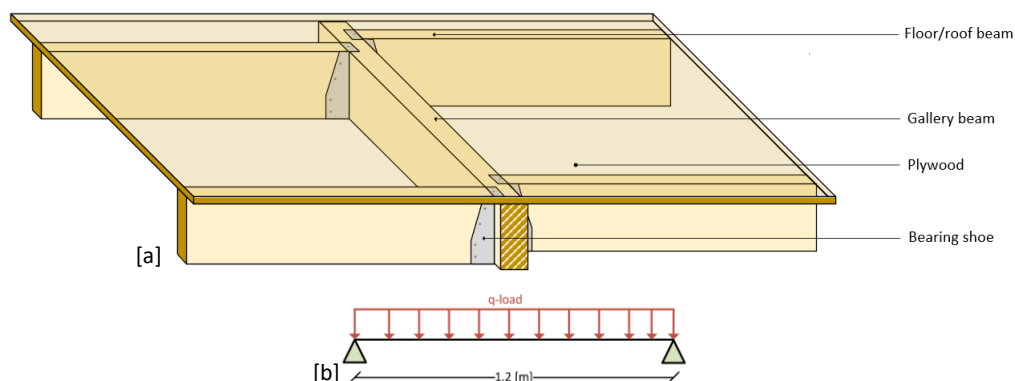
Gallery beam; [a] 3D drawing of the connection. [b] Simplified structural scheme of gallery beam (Self-produced).
